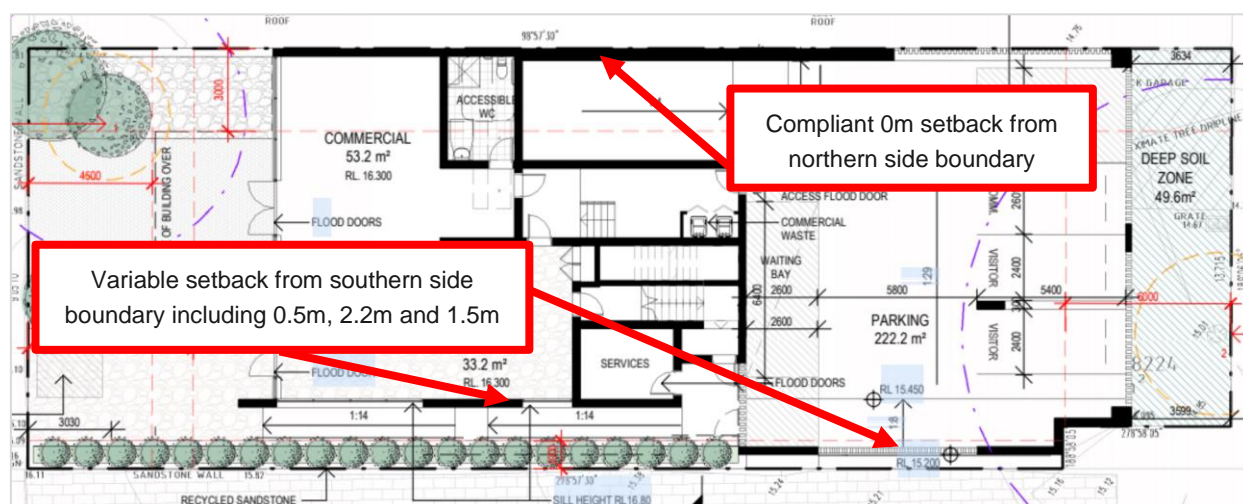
Extract of proposed ground floor plan demonstrating side setbacks (Source: DWA/Gyde)
